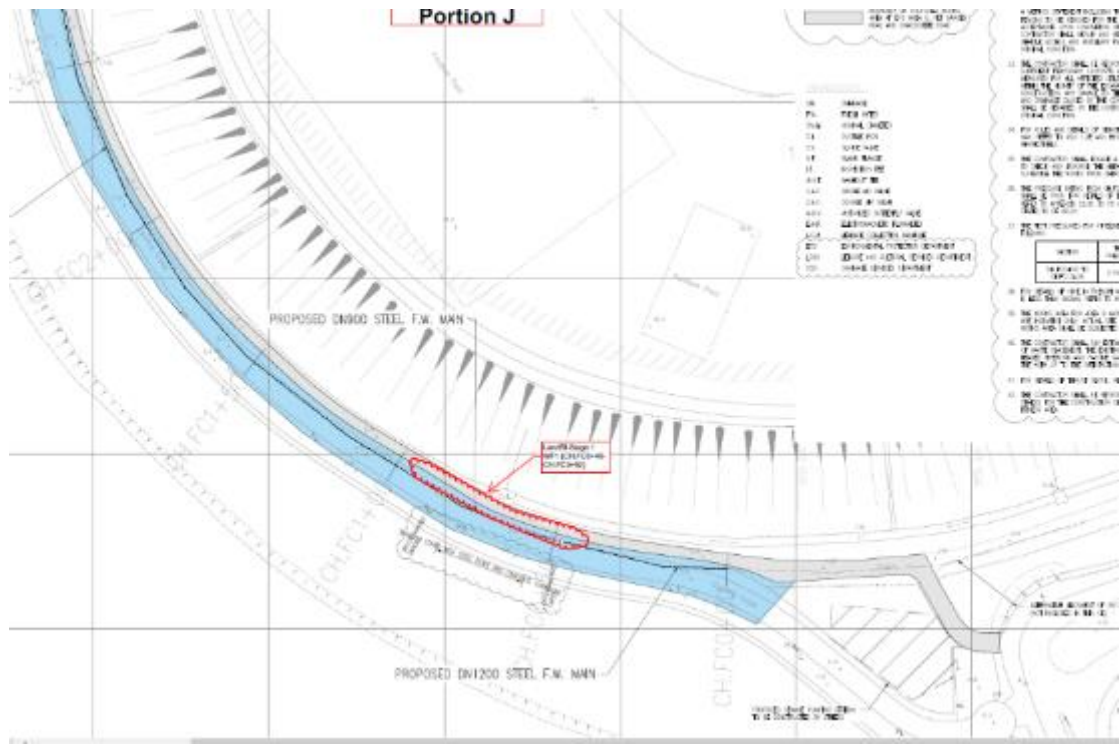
Location Plan – Landfill Stage 1 (Area FC0+42 -FC0+92)
